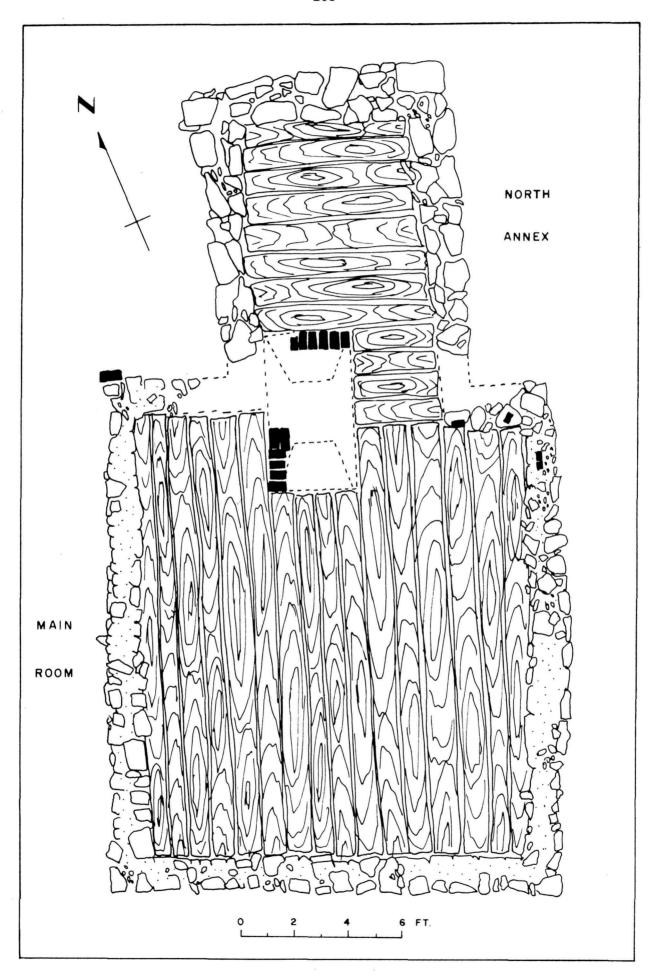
1F17 - Excavation plan of unidentified French building No. 2. (1F-72-102-38).
